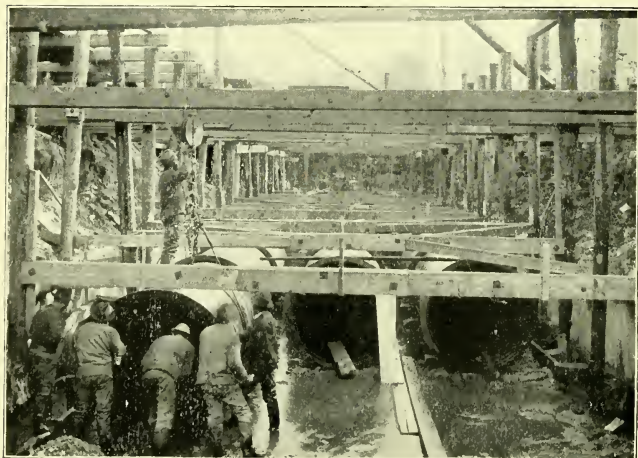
LAYING 3 60-INCH PIPE LINES IN COFFER DAM
